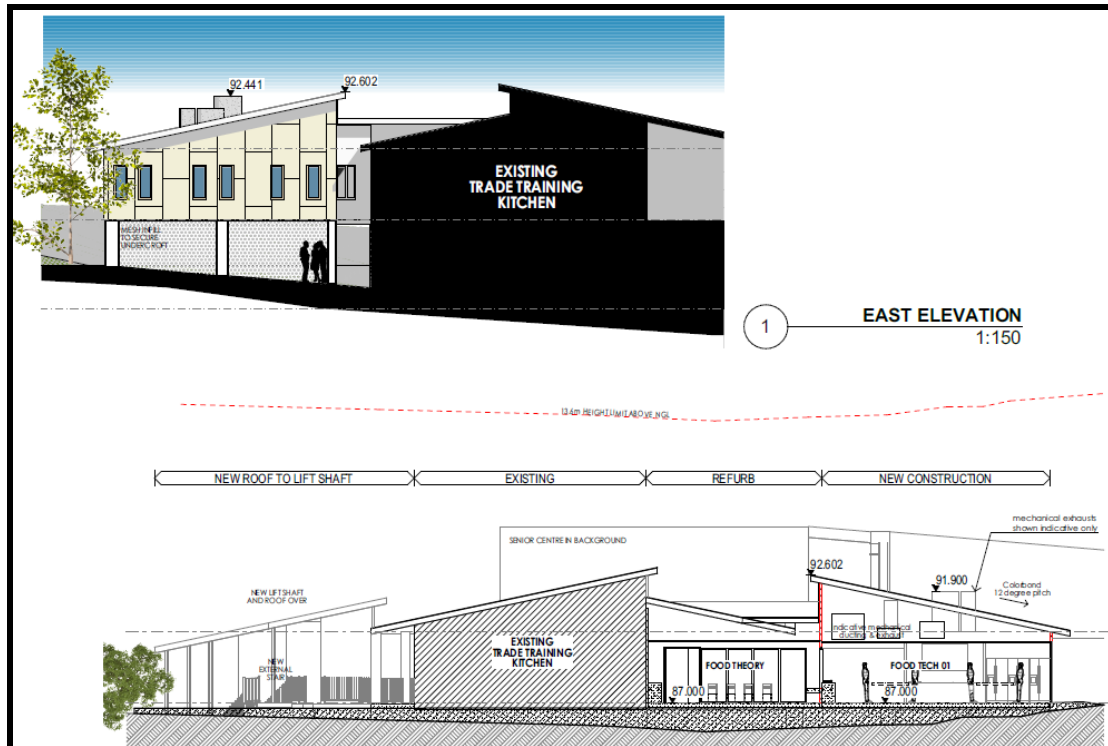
Proposed New Food technology Classrooms (Source: Raunik, March 2023)
